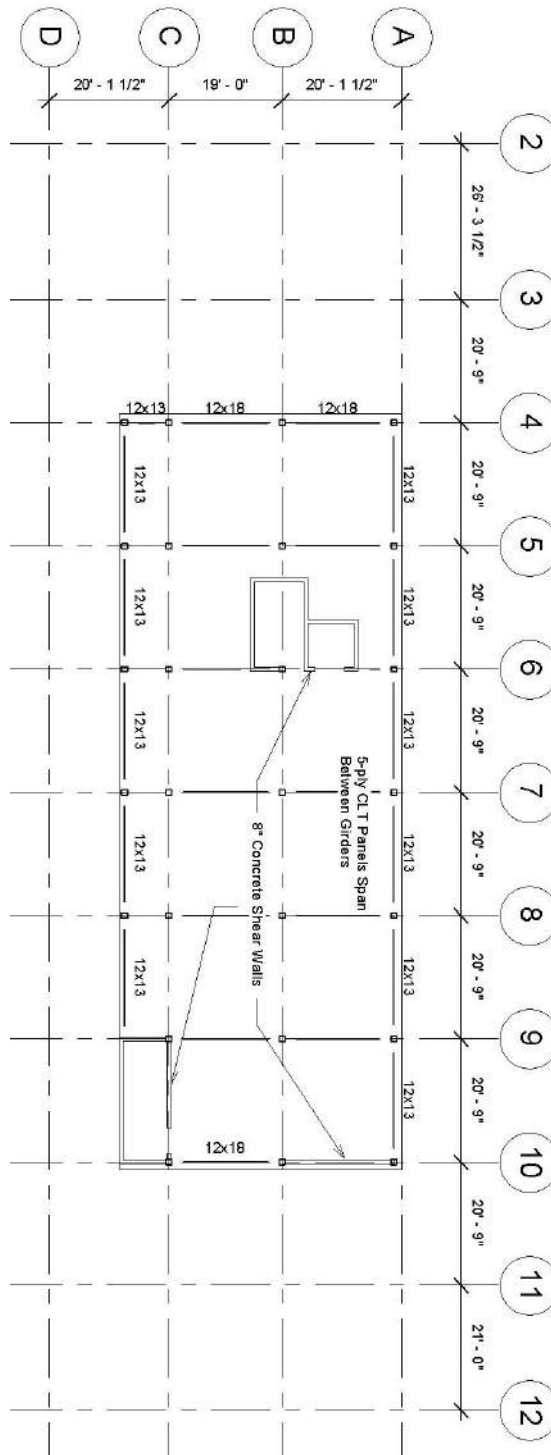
Typical Level Structural Plan. Unless otherwise noted, girders are 15" deep typ.
